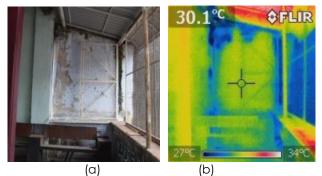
Left wall at the balcony at first floor: (a) visible; (b) infrared thermal image
